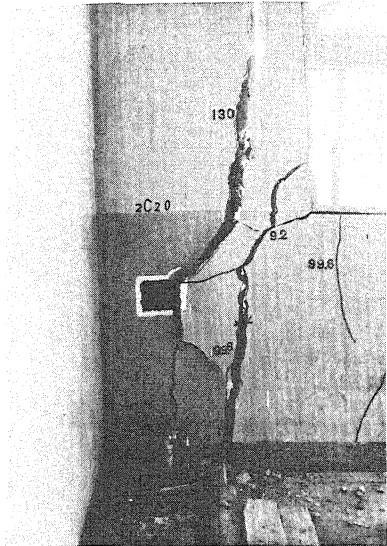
Cracks in 2nd Storey Interior Column (Hamamatsu Walled Frame).
